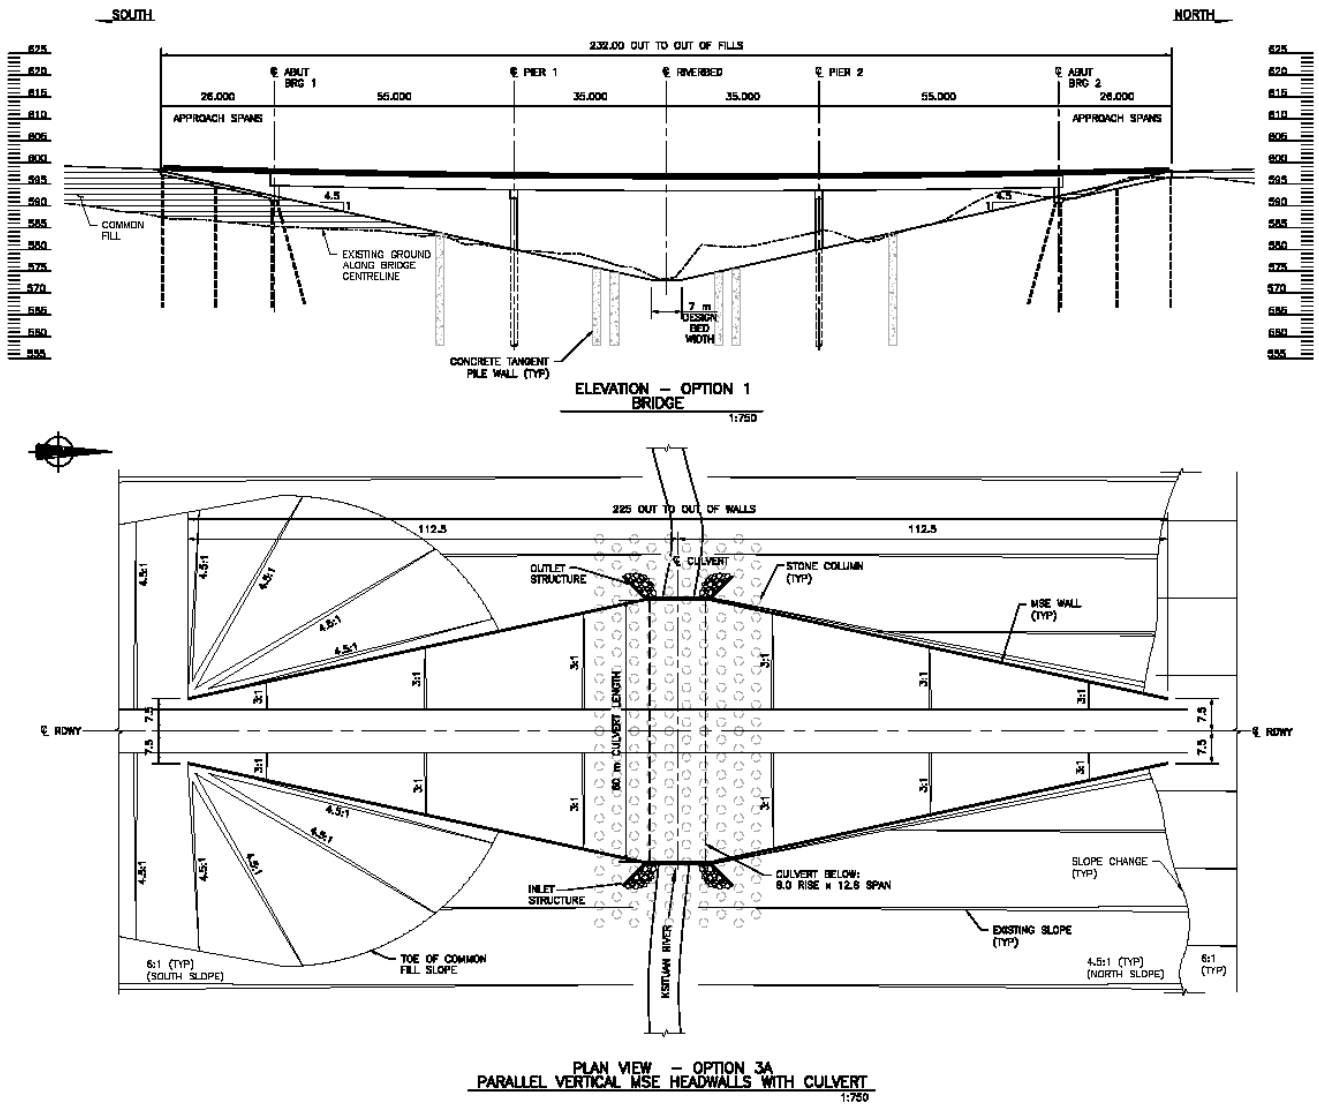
Elevation View – Bridge Option; Plan View – Shortened Culvert Truncated by MSE Walls
